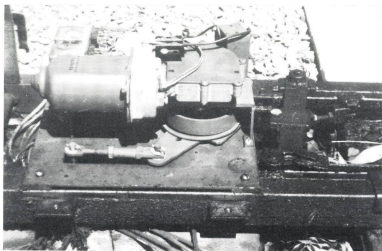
Point motor drive mechanism. After the blades have been moved over, the mechanism at the right firmly locks them in place, and the motor is disconnected via the clutch.
